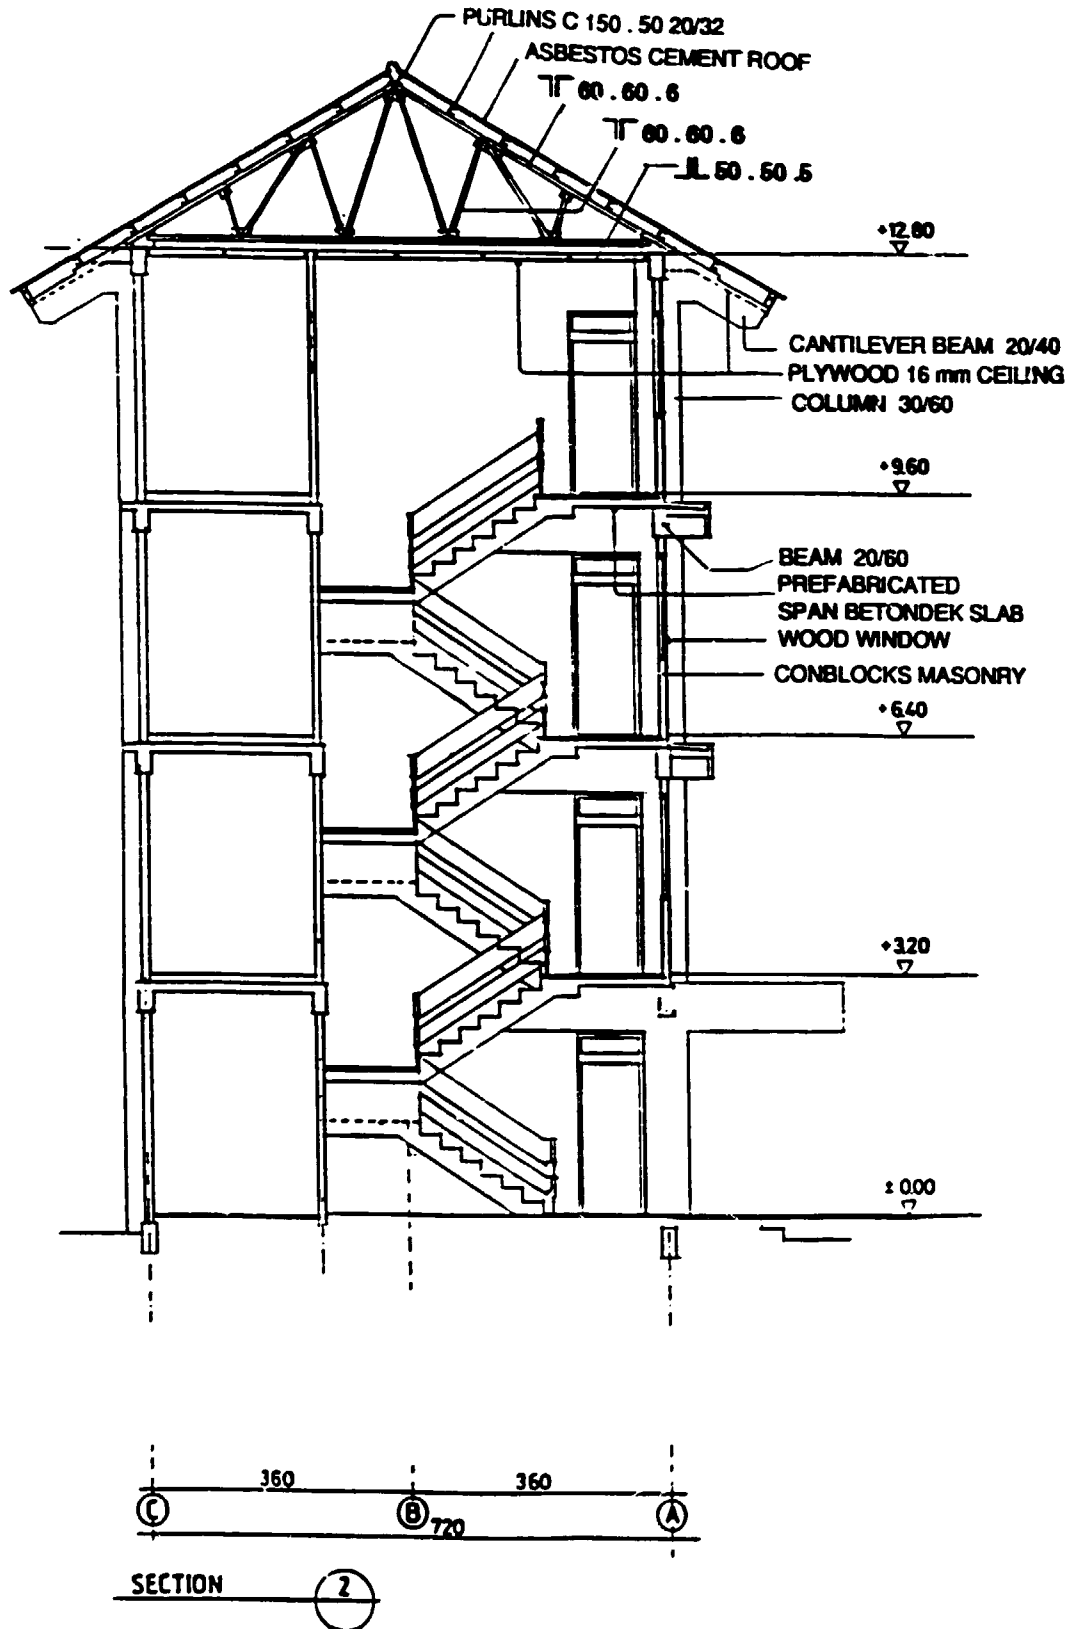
Vertical section, showing structural elements, through entrance area of building. Section parallel to short side.
